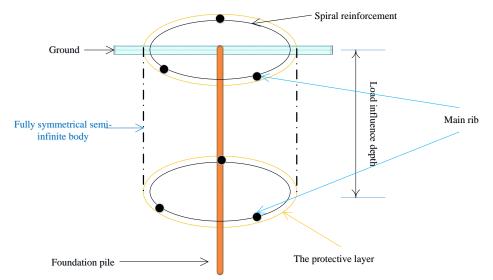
Schematic diagram of pile foundation reinforcement in AutoCAD aided design.
